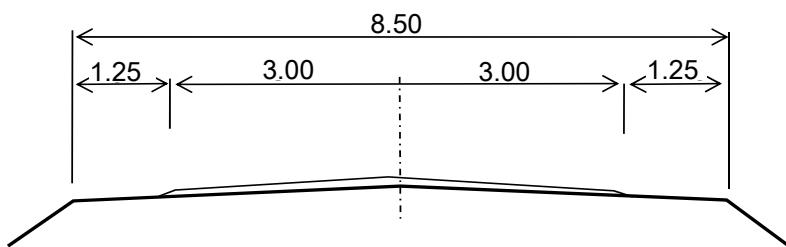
Road Width on National Highway No. 5 (ADB Section)
